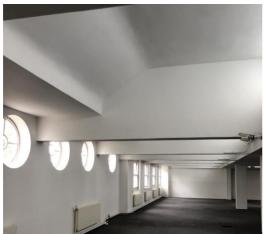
First floor of the former no.38 Fitzroy Square showing modern open plan layout.
